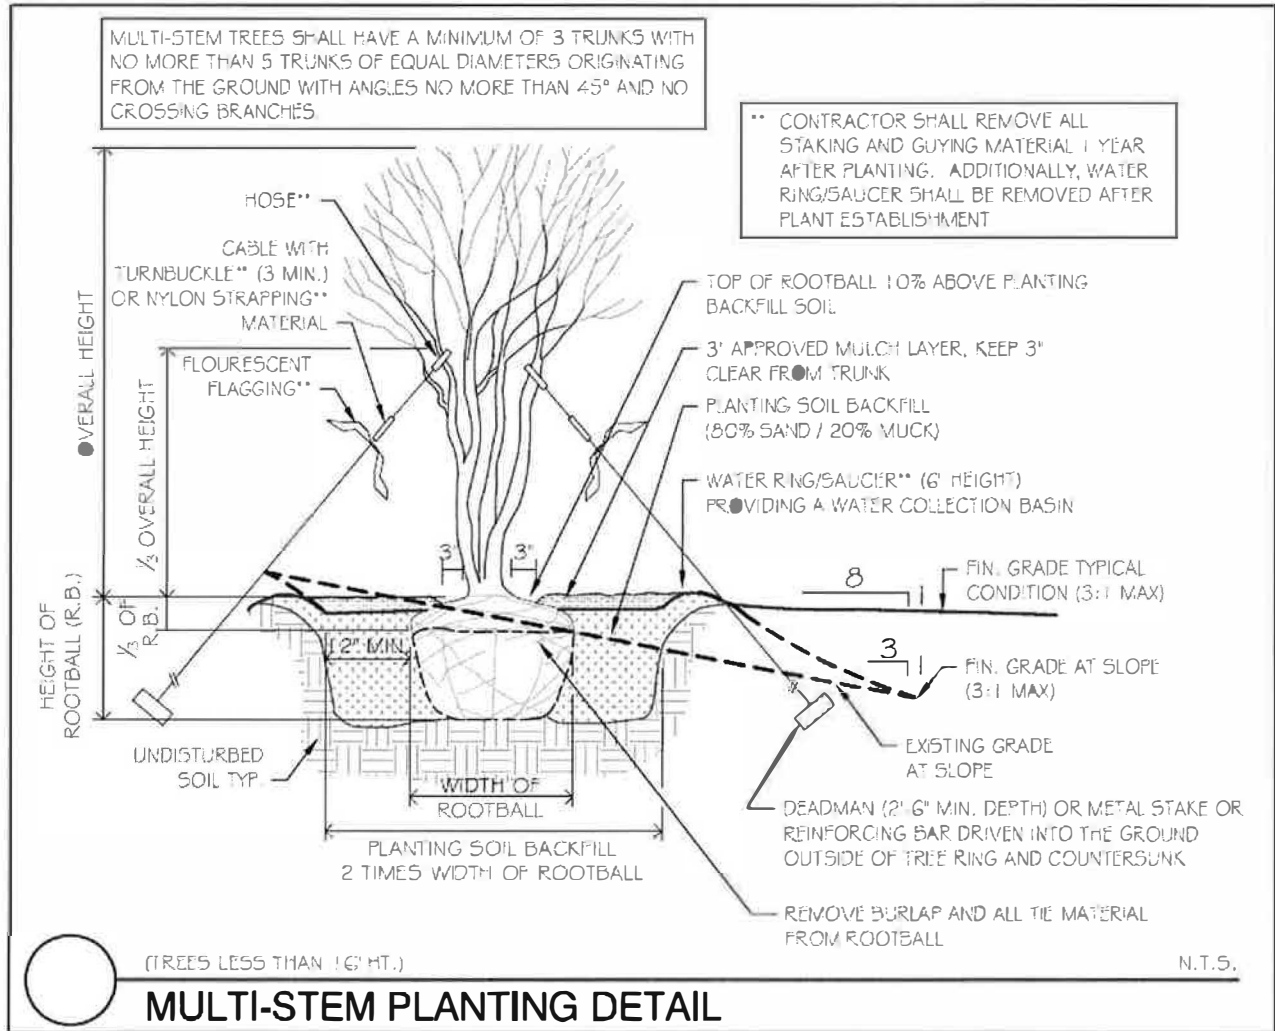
(B) – MULTI-STEM PLANTING DETAIL
